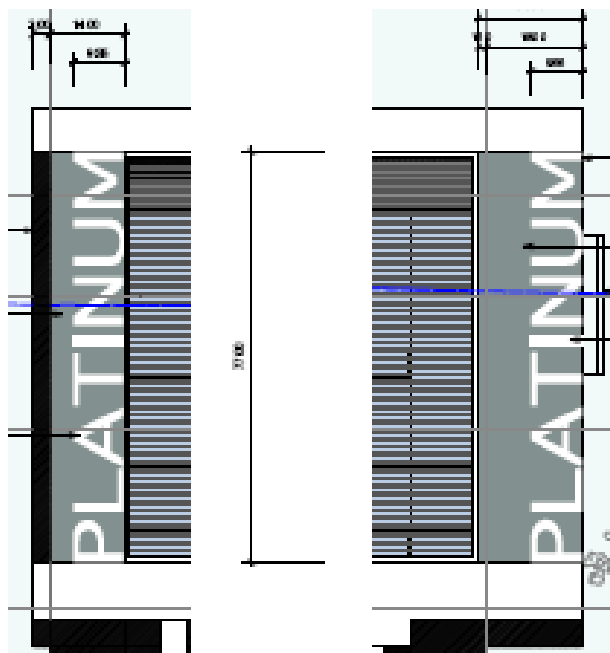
Elevations of the proposed upper level illuminated 'Platinum' signage to be located at the corner of Bourke Road/Collins Street
